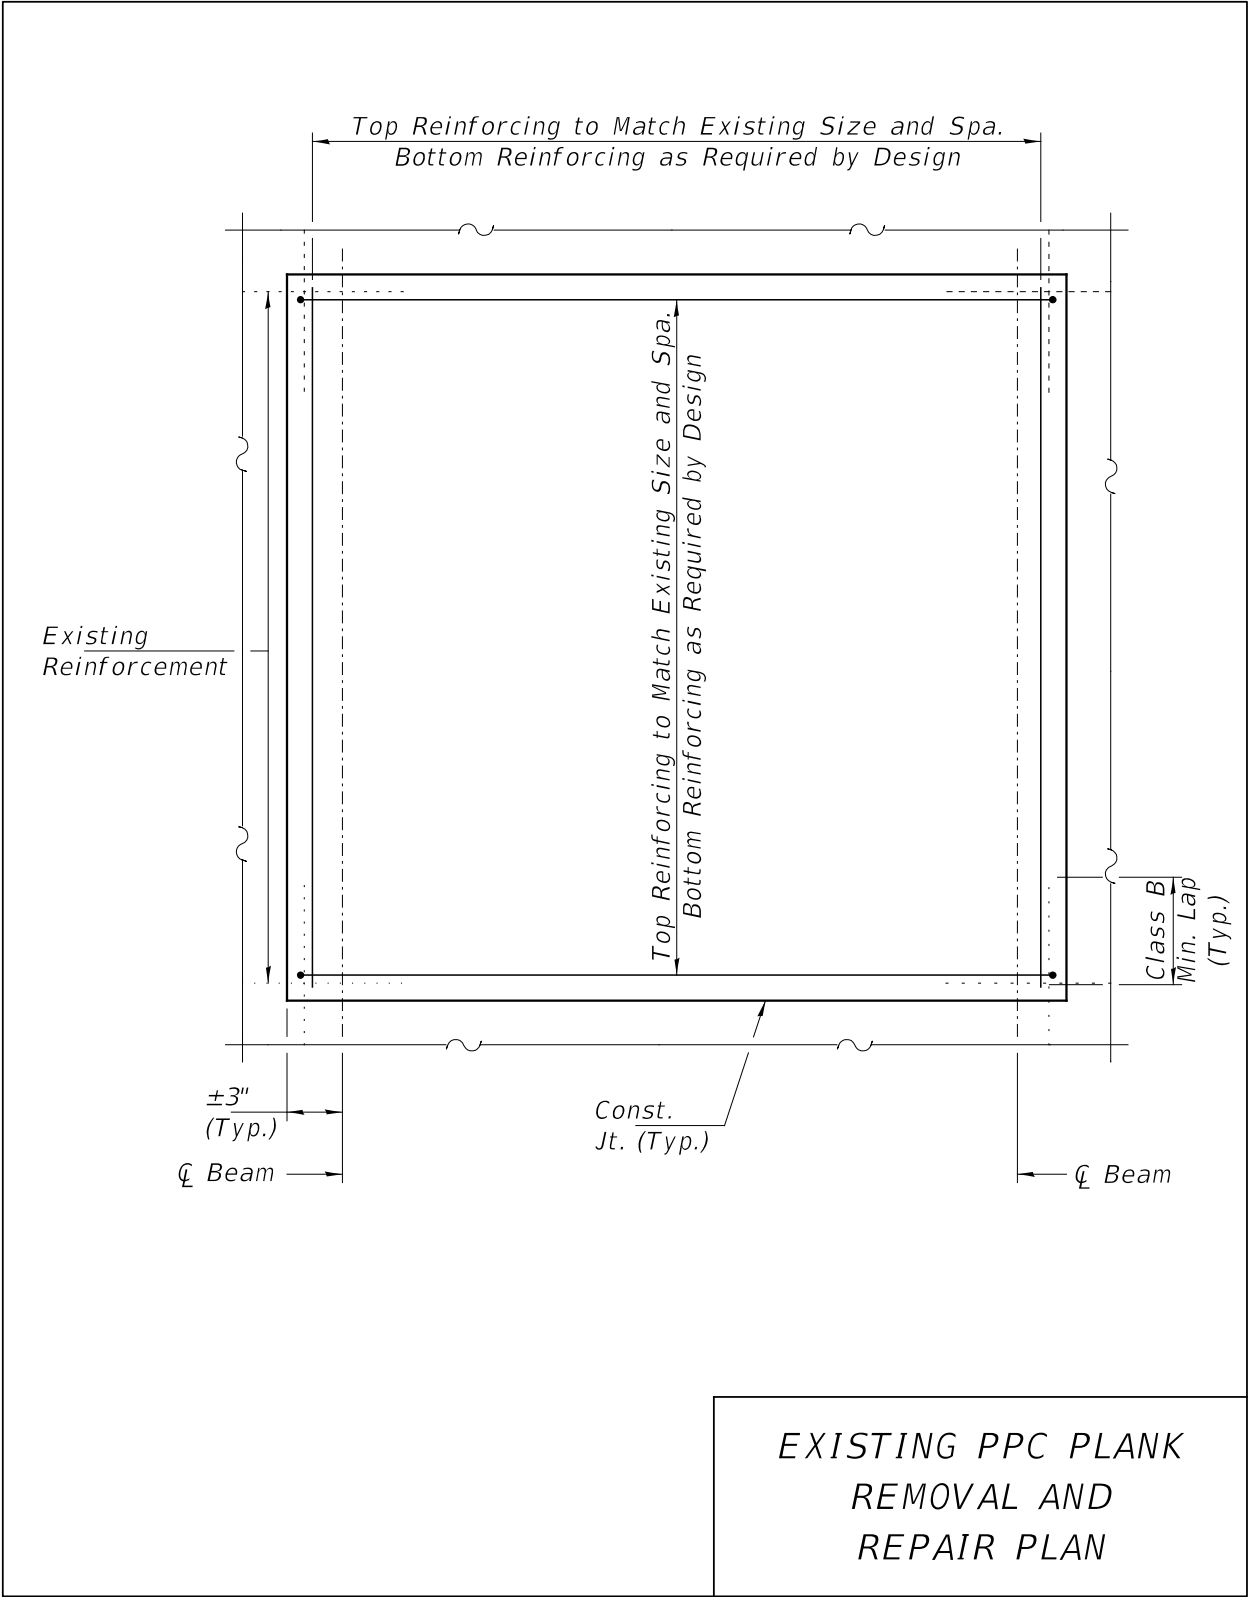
Existing PPC Plank Removal and Repair Plan
